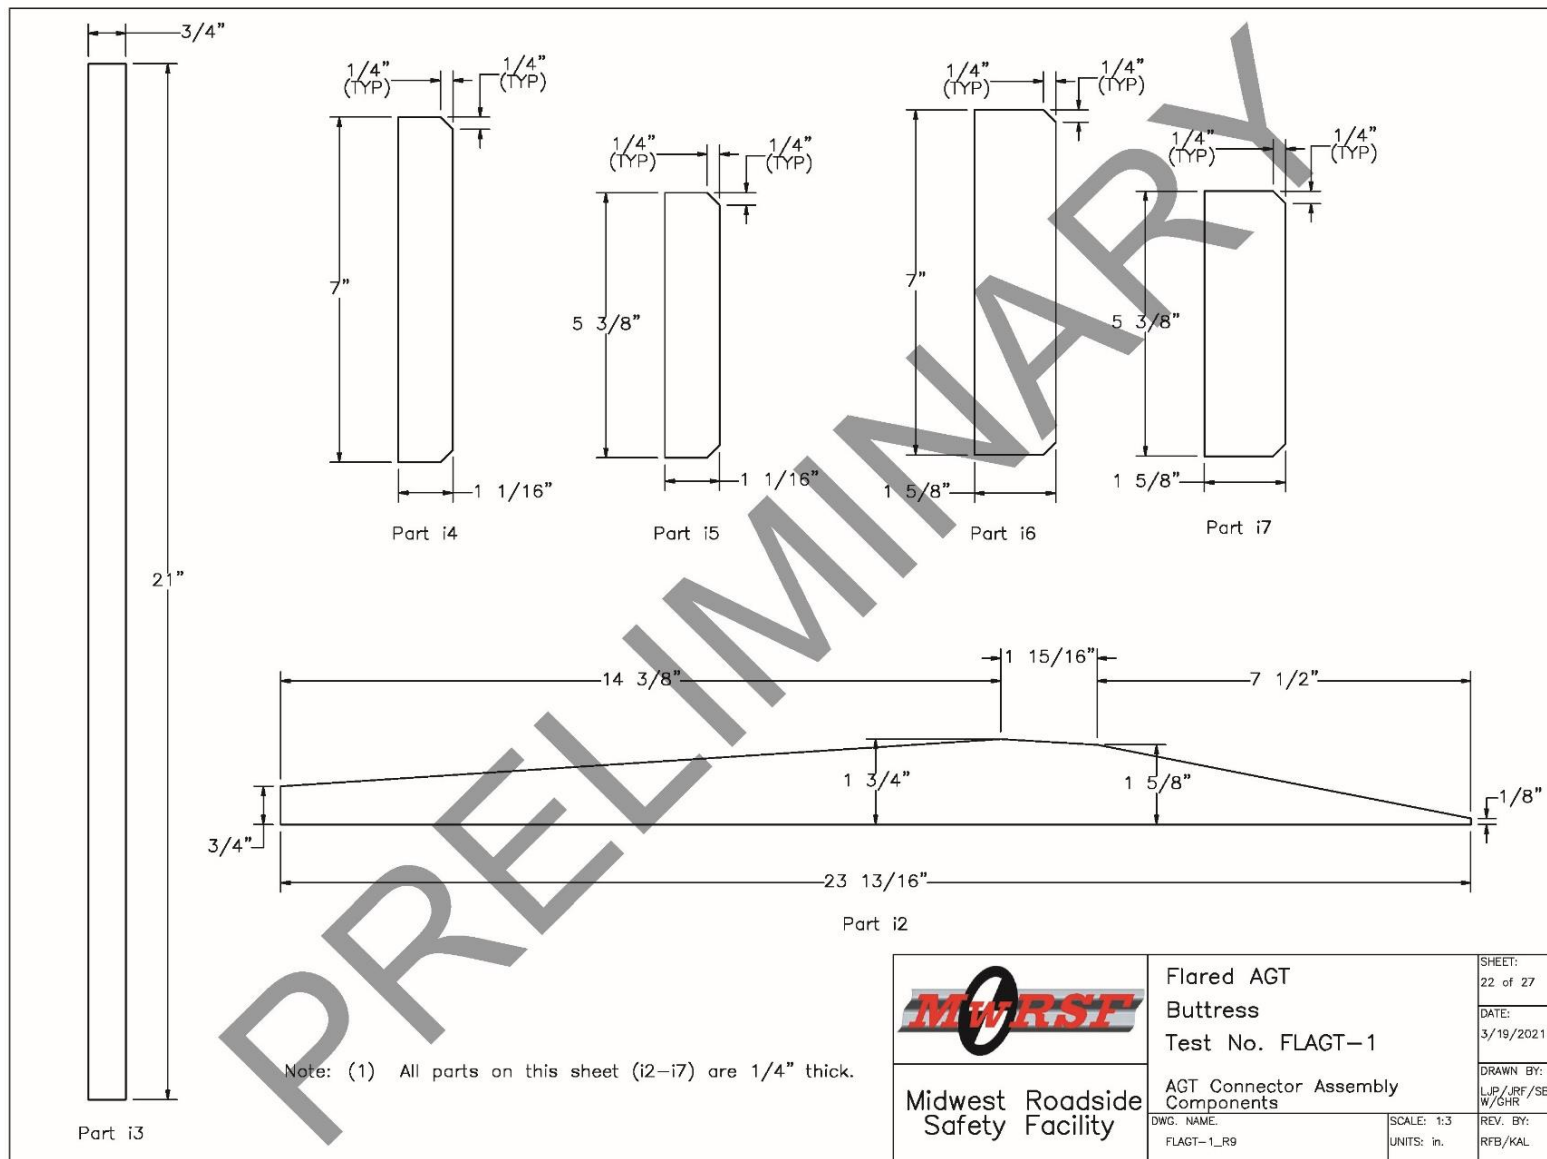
AGT Connector Assembly Components, Test No. FLAGT-1
